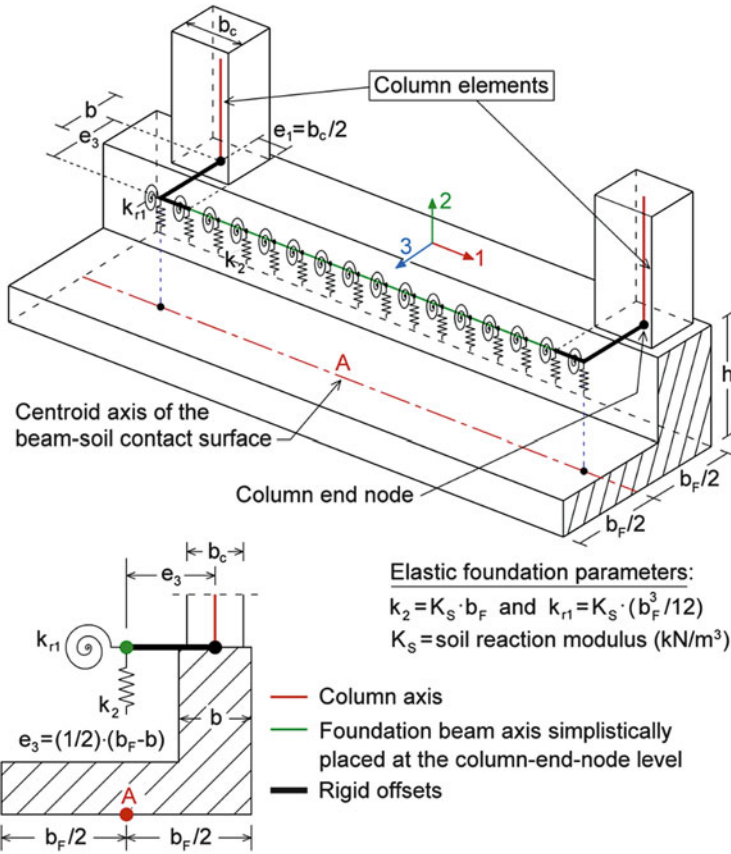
Simplified modeling of column-foundation beam eccentric connection
